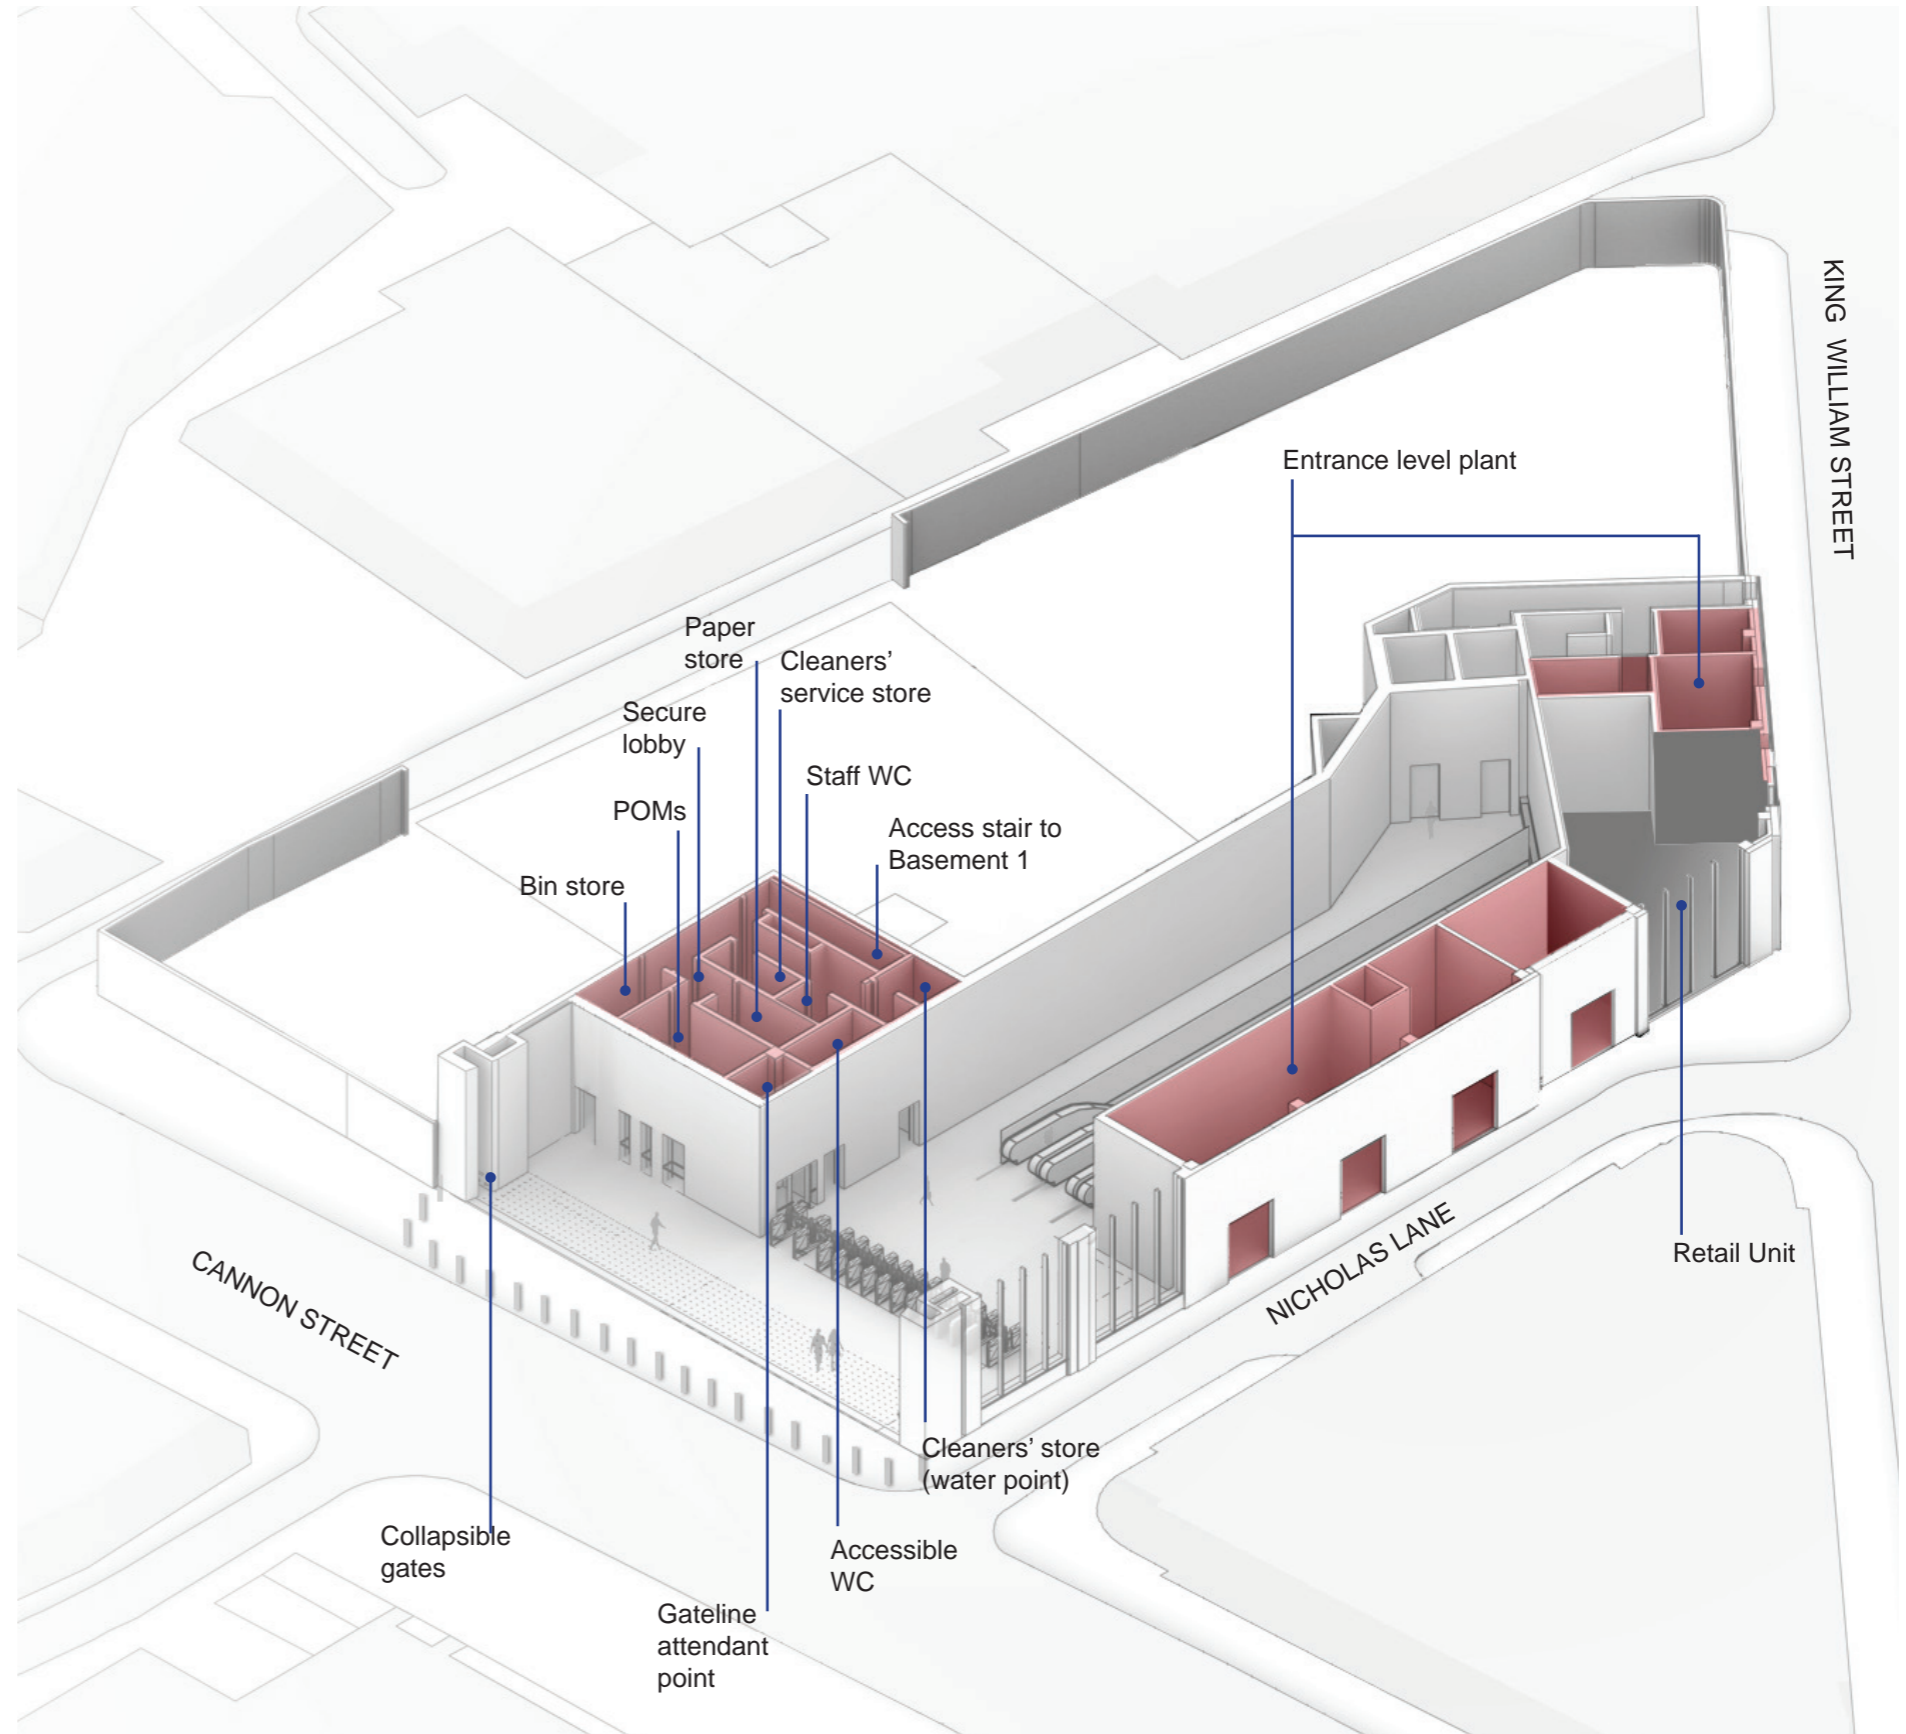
Isometric view of proposed Station Entrance ground floor showing back-of-house facilities
